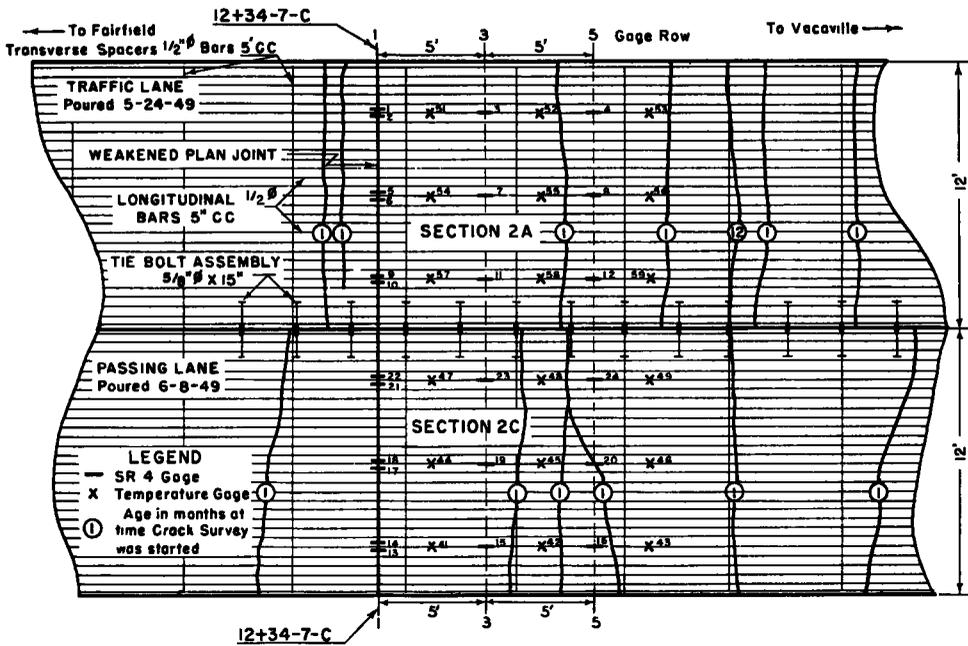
Plan of Placement of SR-4 Gages on Steel and Crack Formation—Sections 2-A and 2-C
